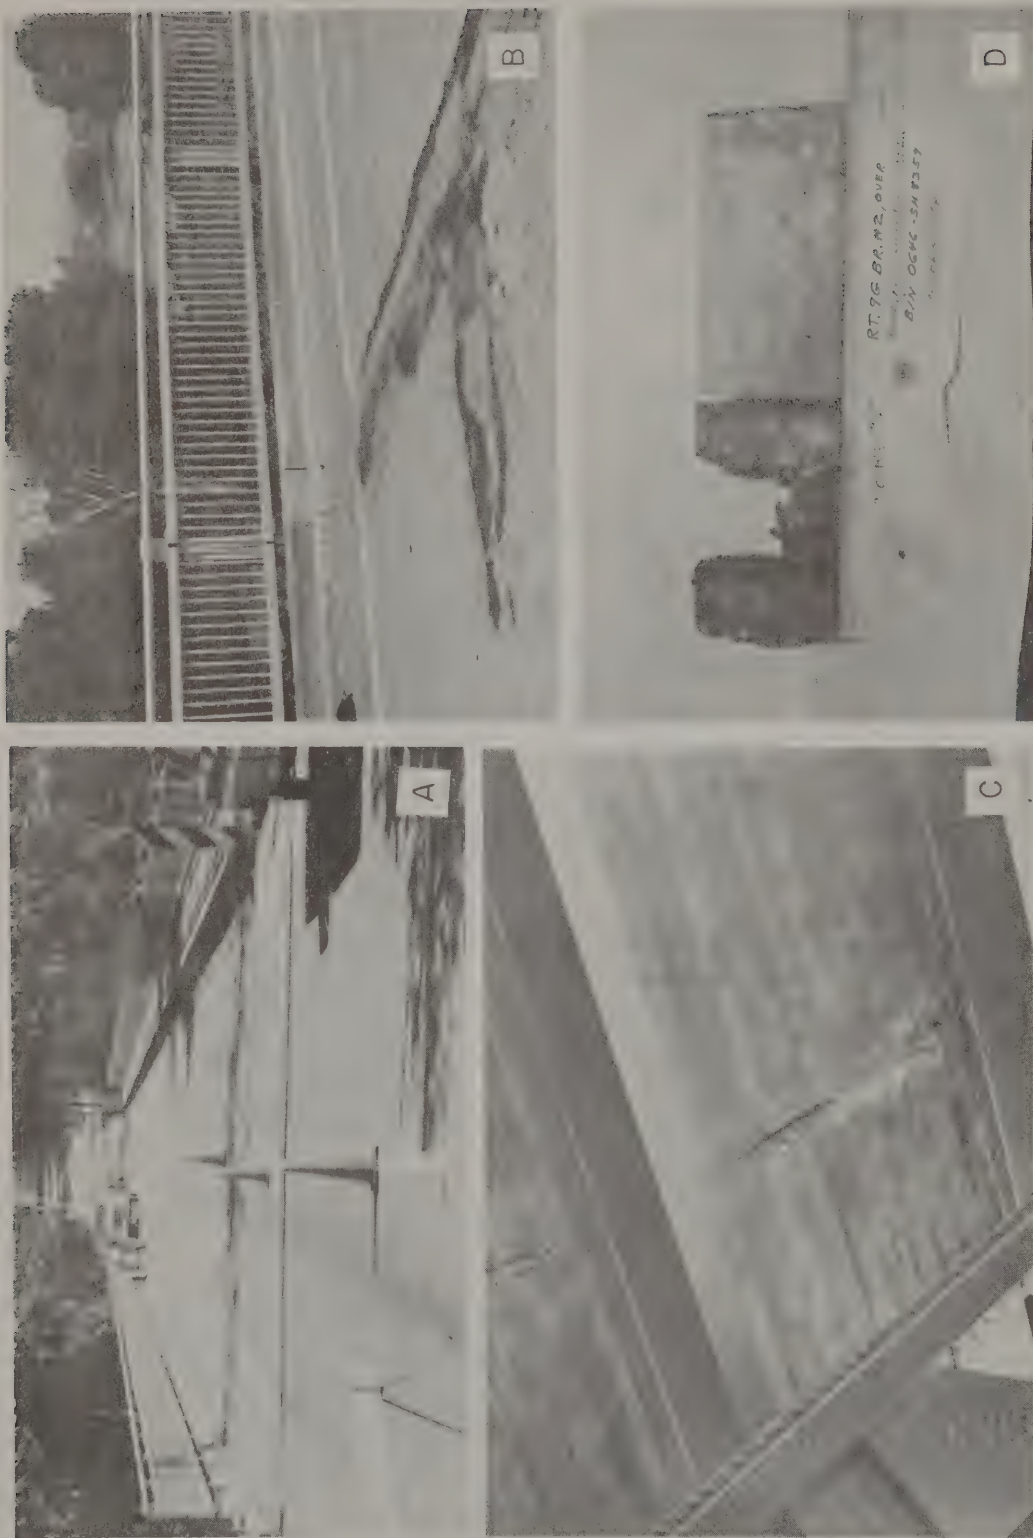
Before removal of existing bituminous overlay, one-way traffic control was established (A); old overlay had patches at armored joint over center pier (B); longitudinal cracks on underside of structural slab (C) ran the bridge's entire length; core from southbound lane (D) displayed, from left, 2½-in. bituminous overlay, 2-in. of rubble from concrete wearing slab, 1½-in. concrete section with horizontal cracks also from wearing slab, bituminous membrane, and 7-in. of solid, crack-free structural slab.
